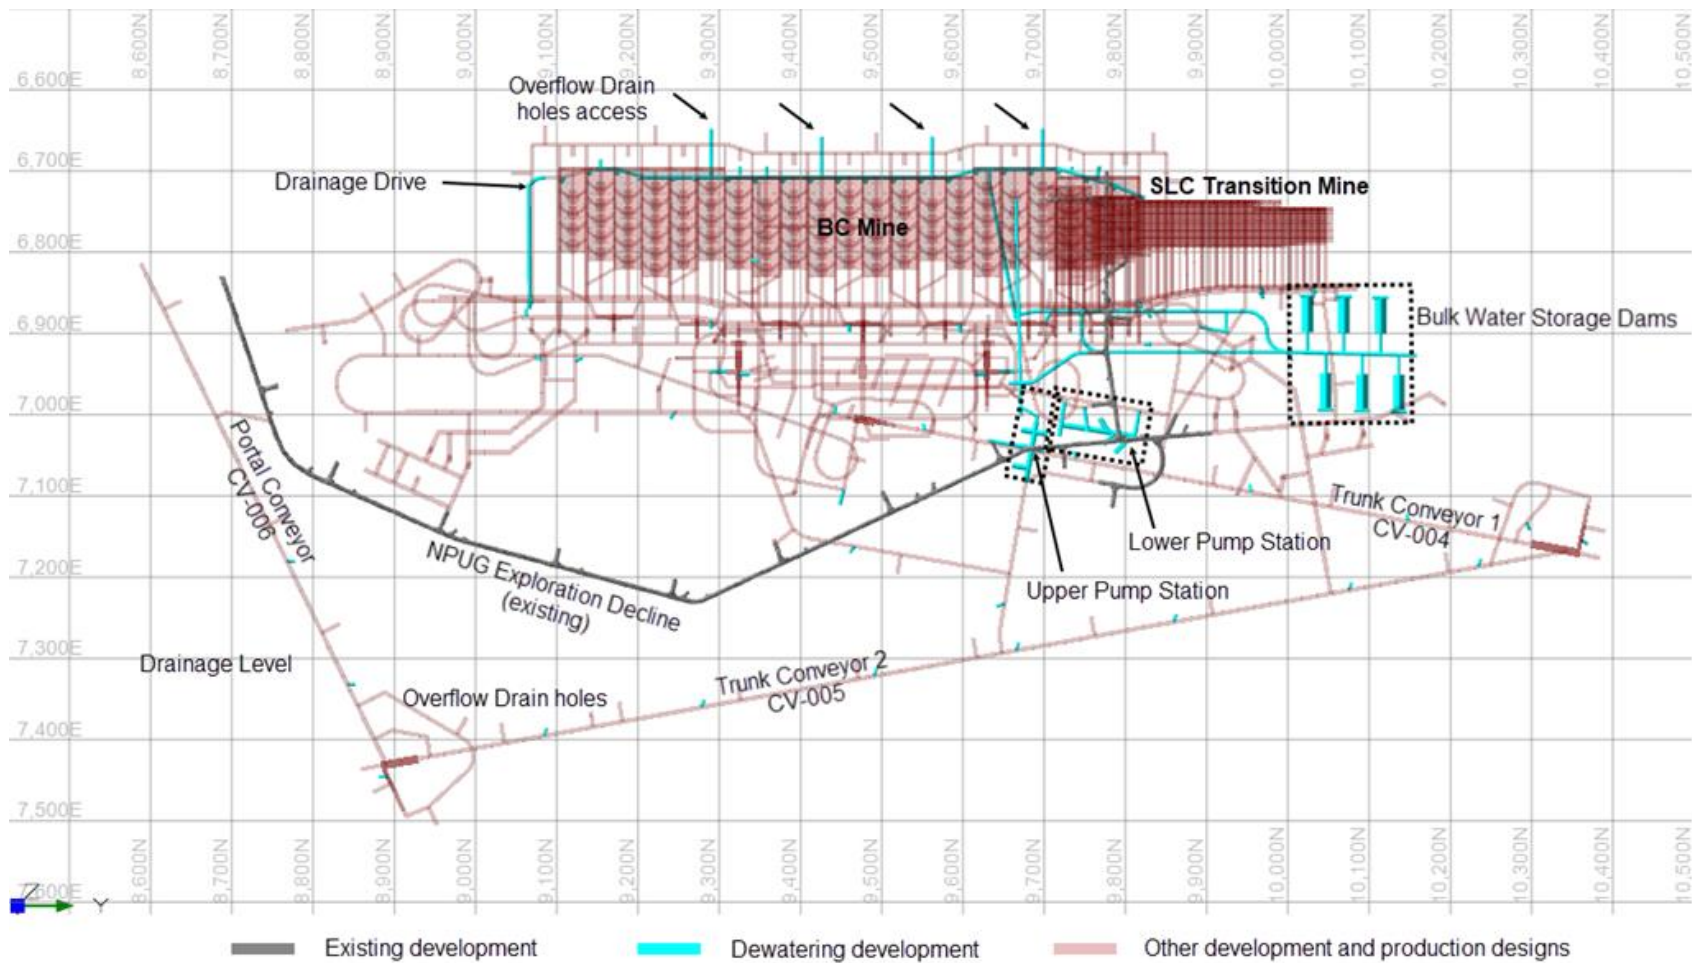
BC and SLC Transition Mine Dewatering Infrastructure (Plan View)
